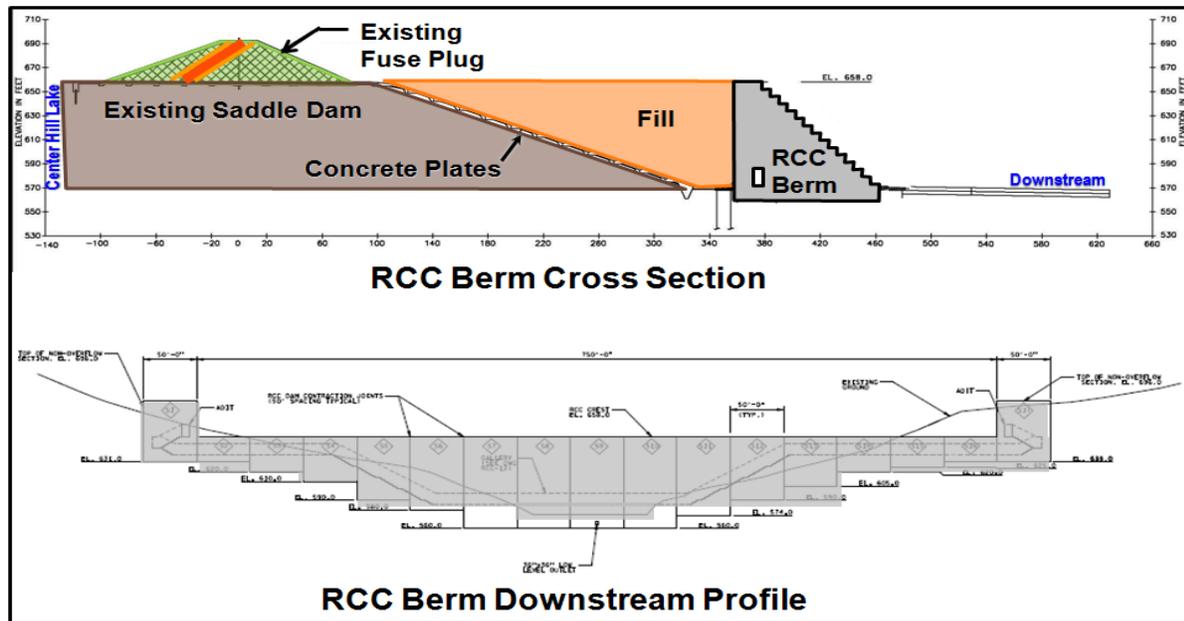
Revised Saddle Dam Plan – RCC Berm.
